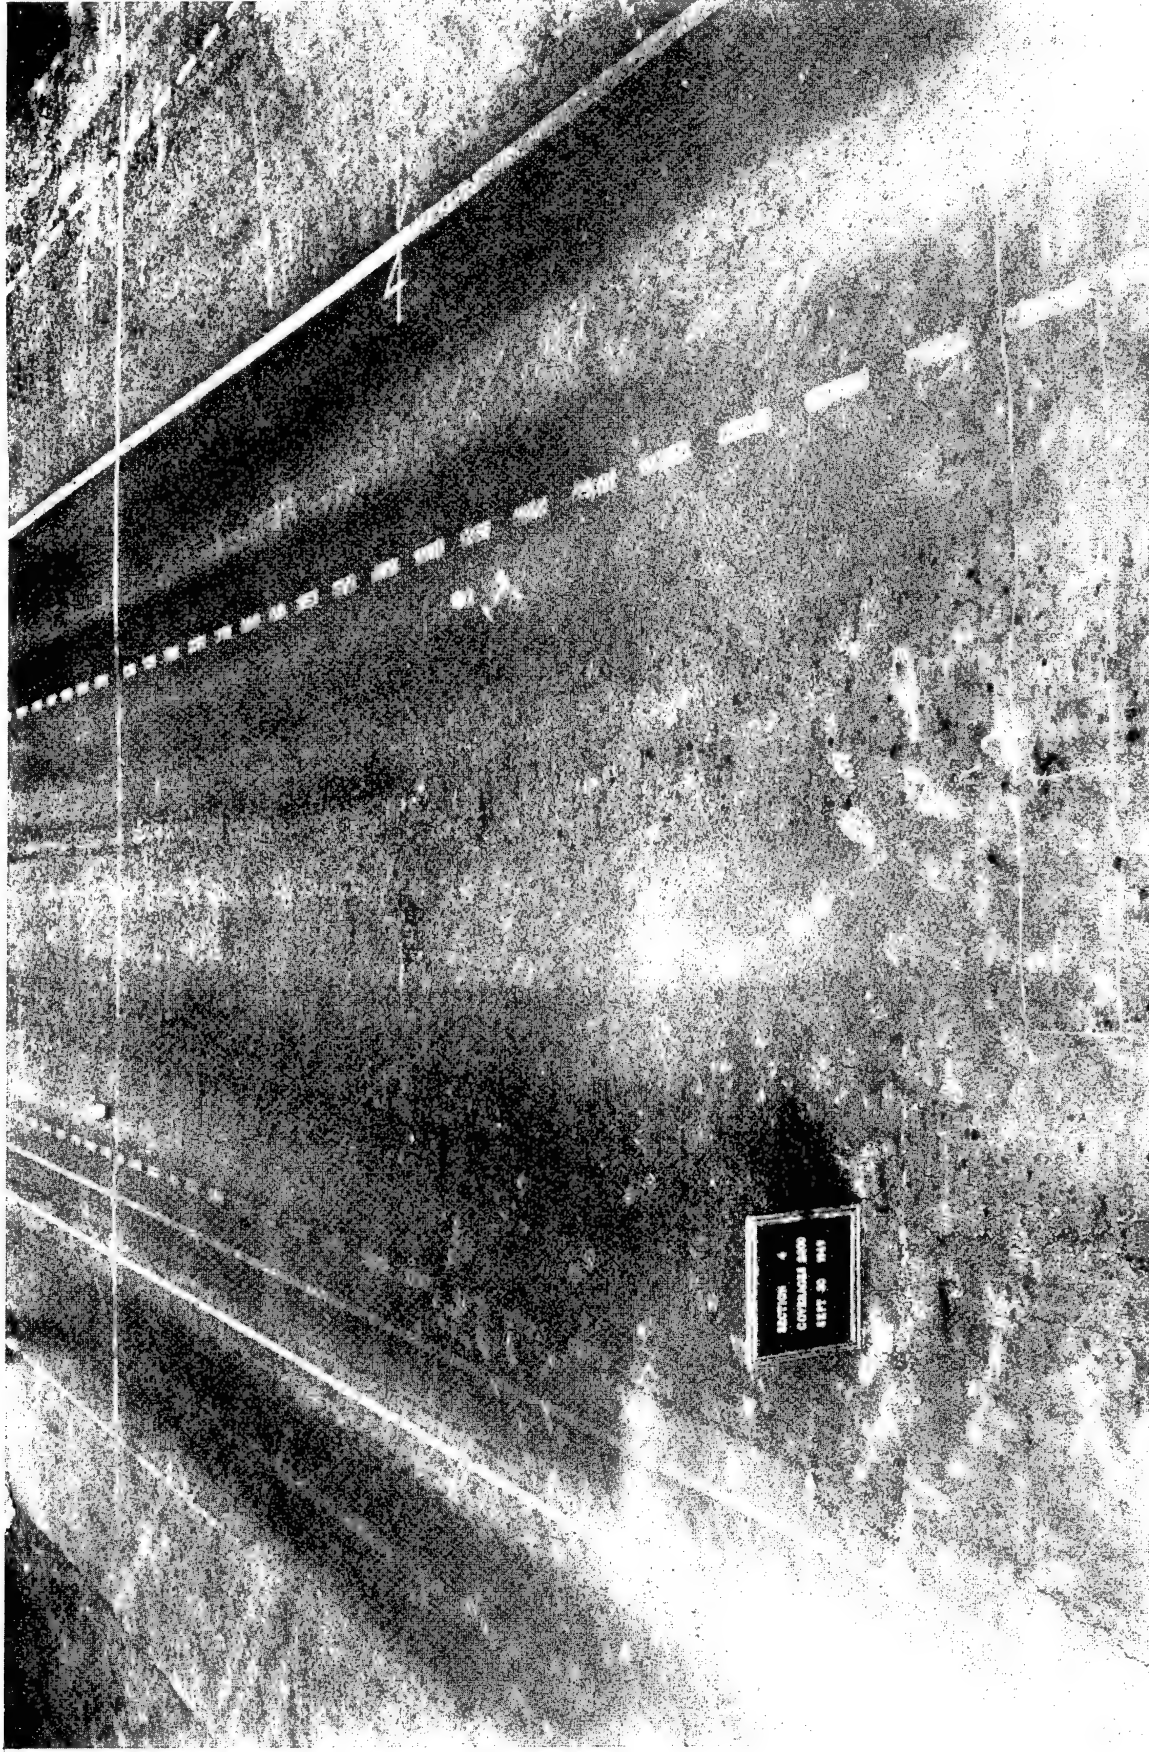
Unit 2, 20-in. thickness. View showing rutting after 2,000 coverages with 200,000-lb load on B-36 assembly
